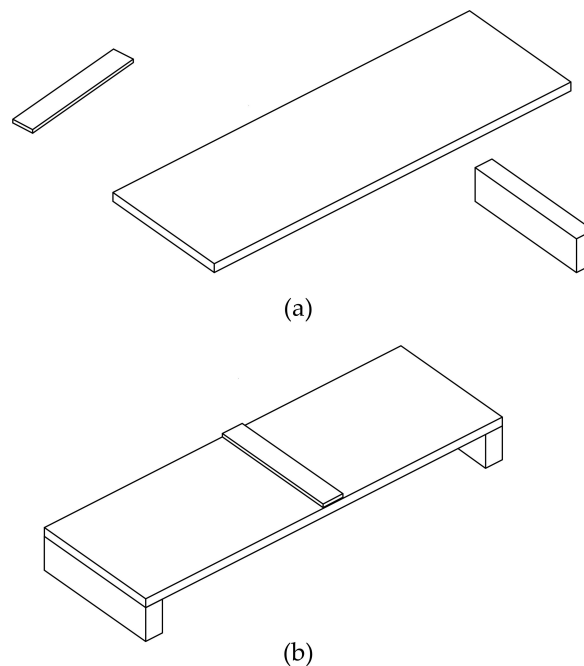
(a) Parts, and (b) assembly in ABAQUS/CAE
